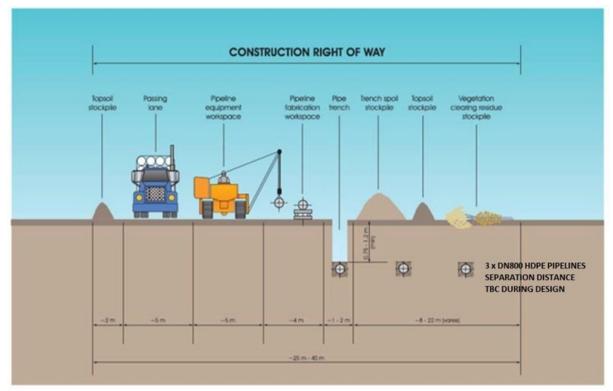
Typical Profile ROW Layout (Exact configuration to be confirmed during design)
